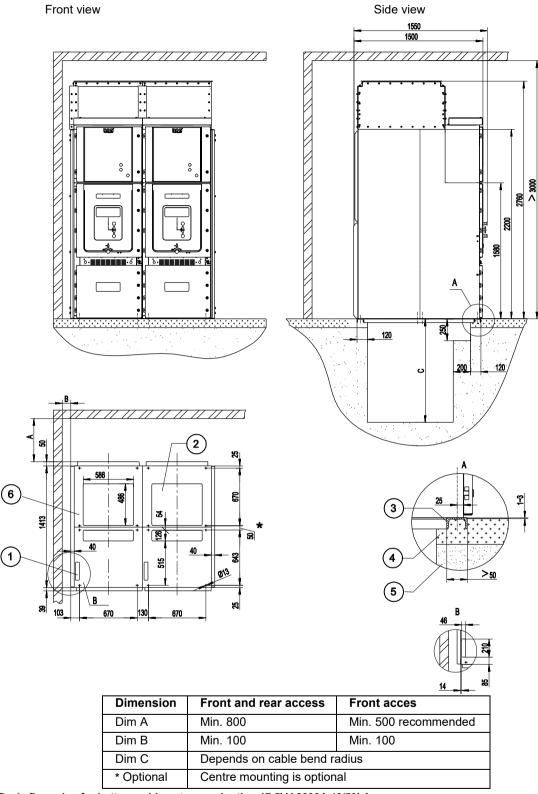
Basic floor plan for bottom cable entry panel rating 17.5kV 2000A 40/50kA
